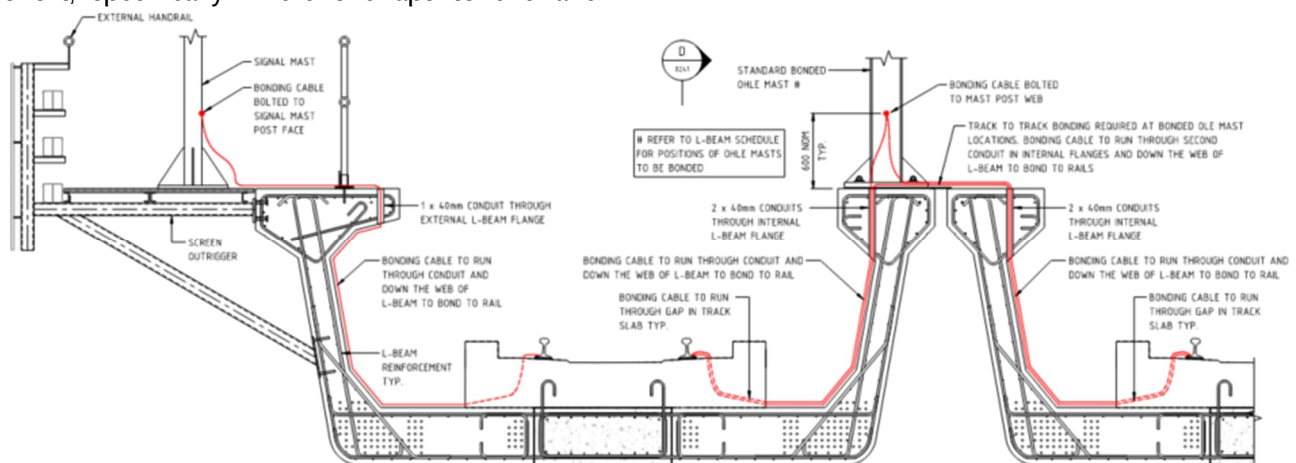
Track slab reinforcement, walkway widen at signalling mast and earthing and bonding
